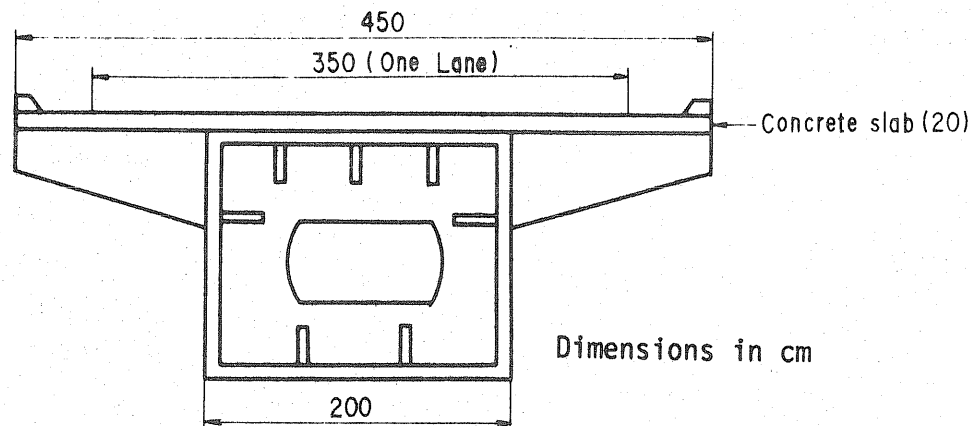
CROSS SECTION OF TYPICAL BOX GIRDER BRIDGE
